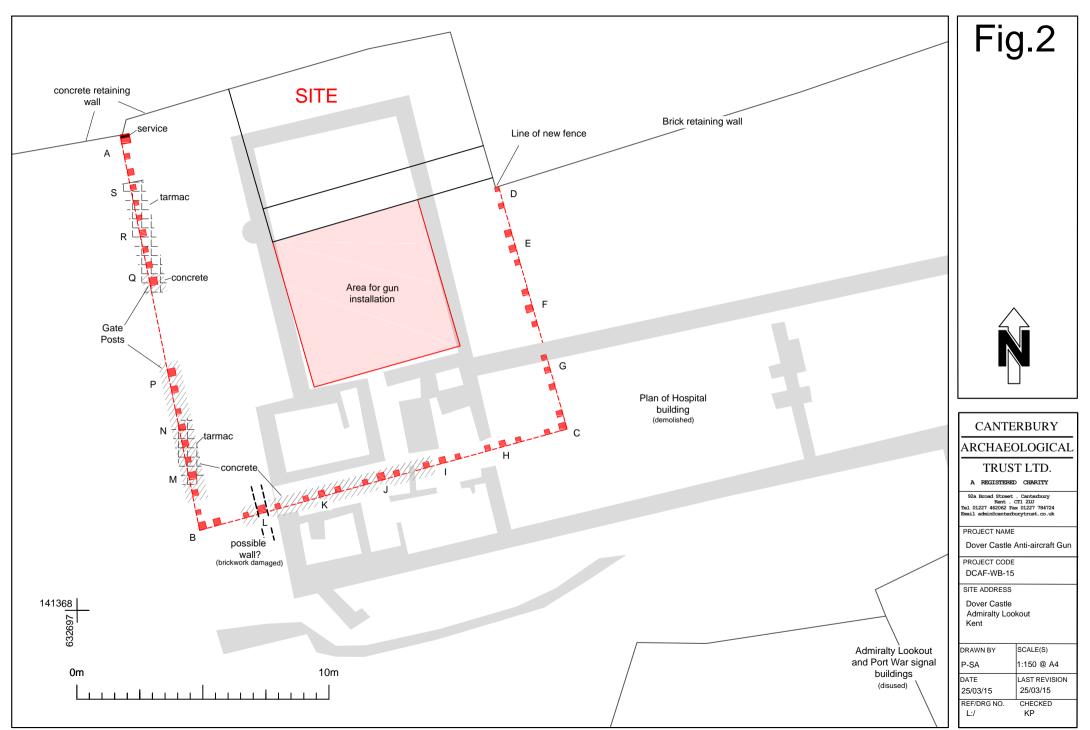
General site plan showing position of excavated post-pits in relation to former hospital building
